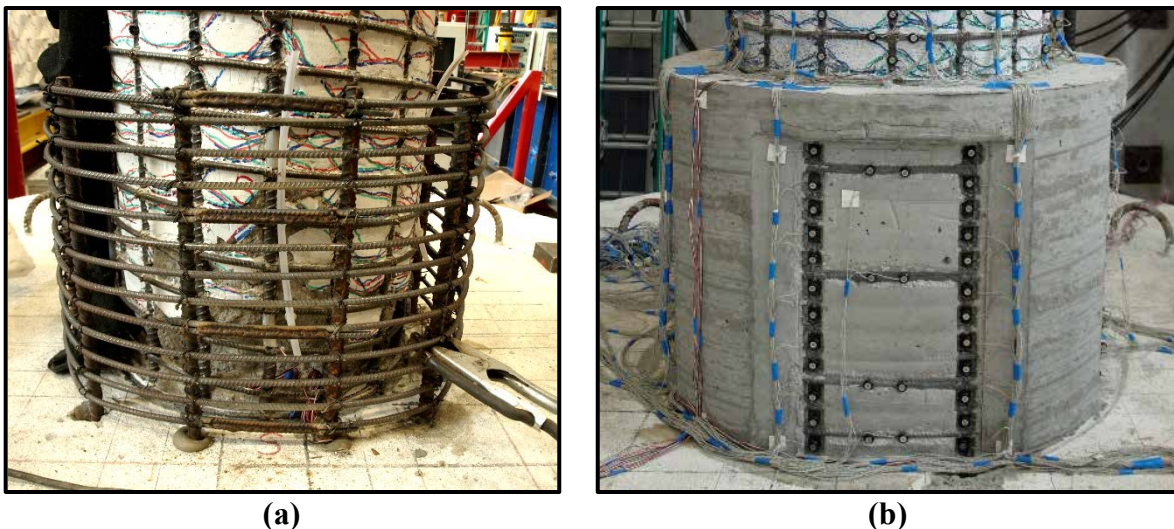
Repair #4 (a) welded rebar hoop construction; (b) blocked out repair section.
